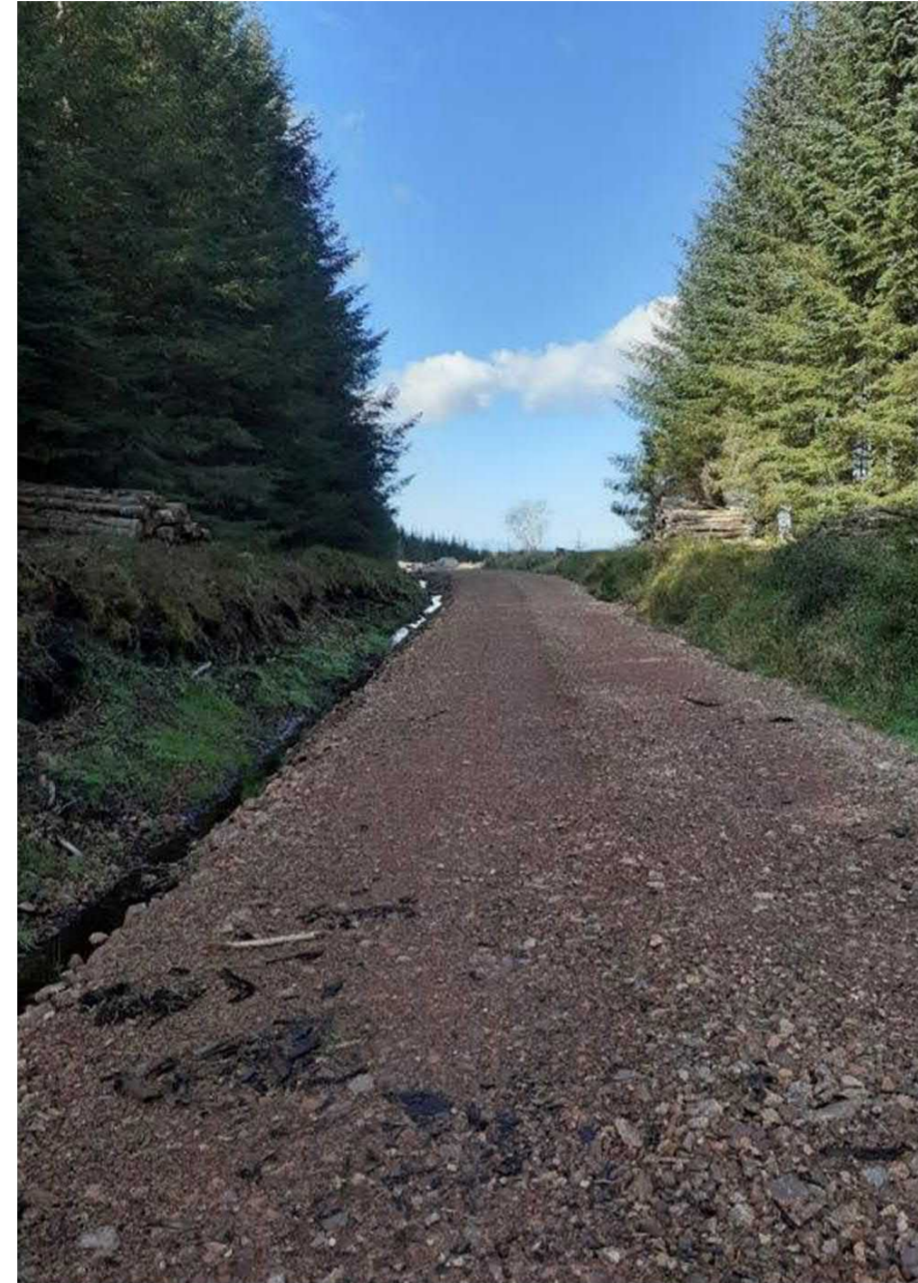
View looking west towards the existing forestry track embankment from NGR 235497, 598945.
